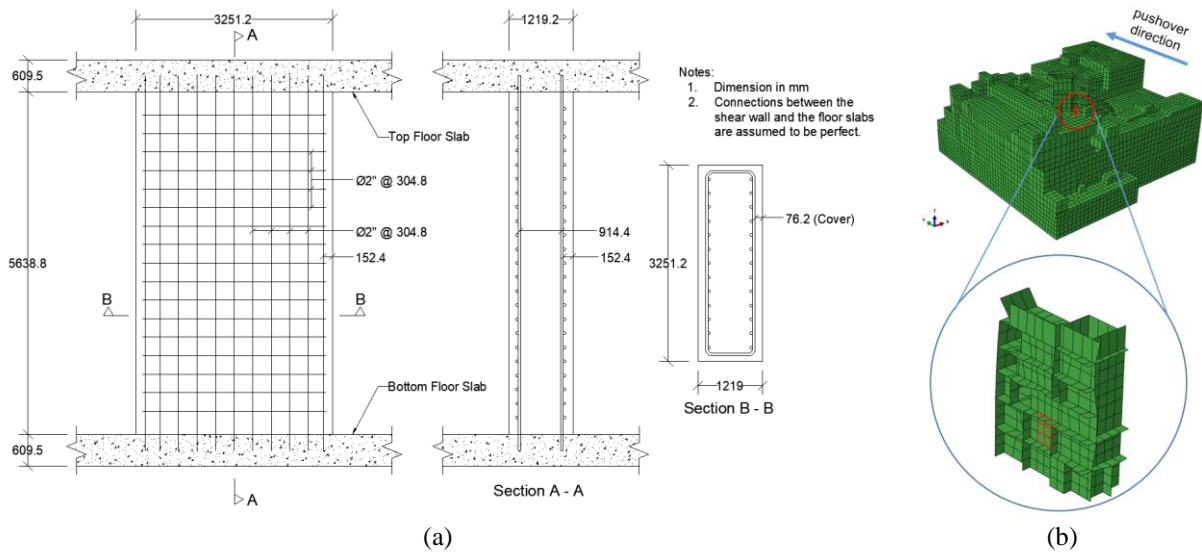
(a) Geometry details of the reference wall. (b) Location of the wall in the building
